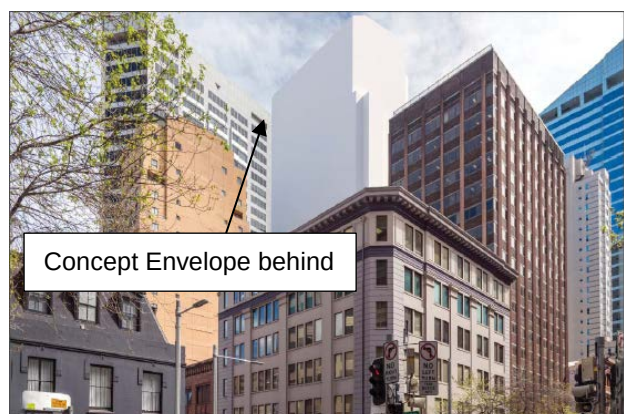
Concept Envelope and building mass assessed in 2017 EIS (Corner of Kent Street and Druiitt Street)
